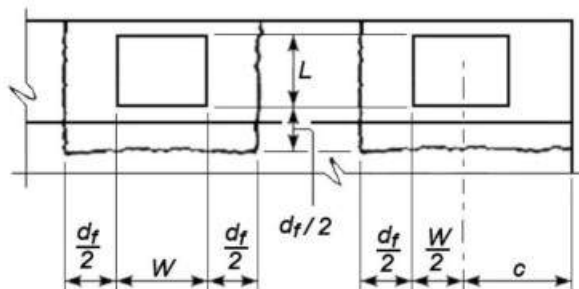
Critical Section for Rectangular Bearing Pads
